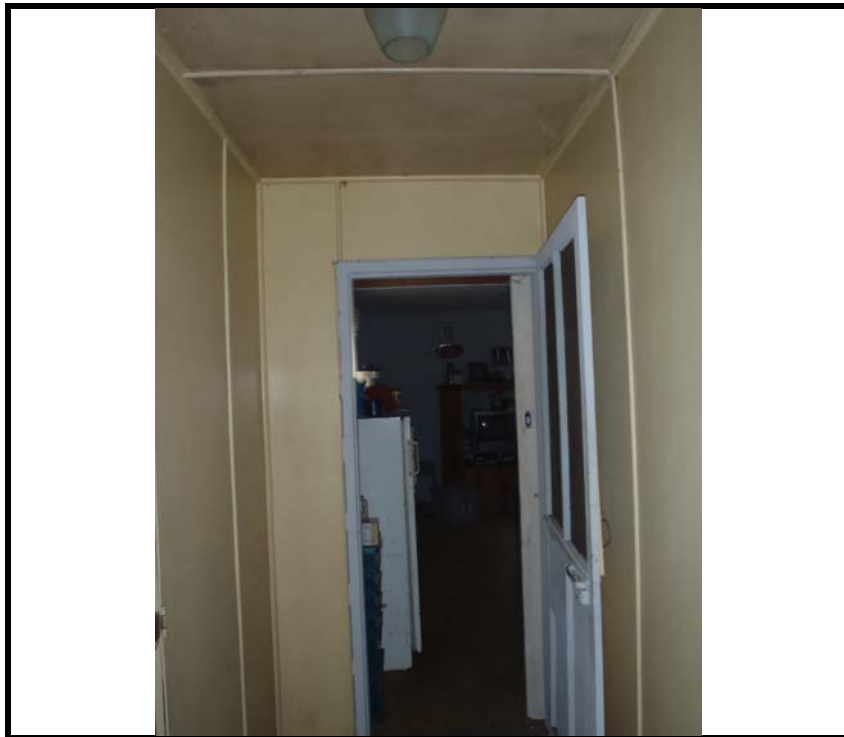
ACM sheeting to the walls and ceiling of the entry room of Unit 1A at 1 McLeod Road.
